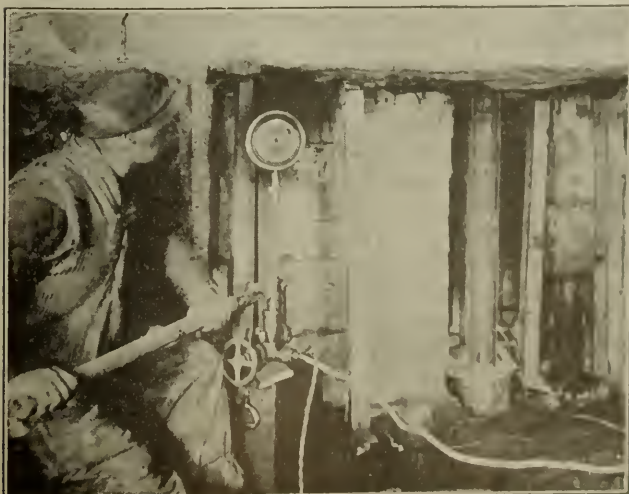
JACKS MAINTAIN LOAD ON FOUNDATION PILES
